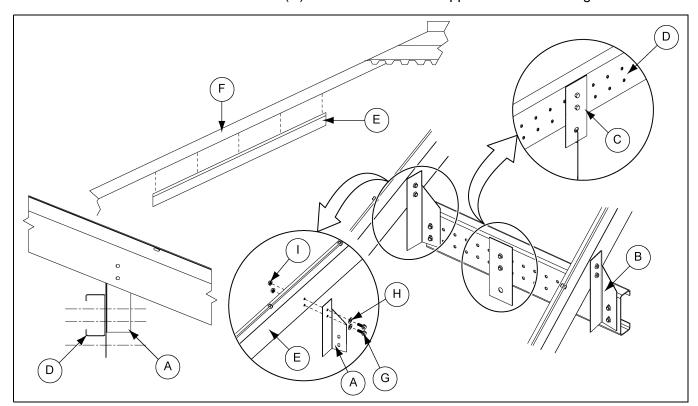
N Roof Truss Details (For 27'-33' Diameter Bins)
